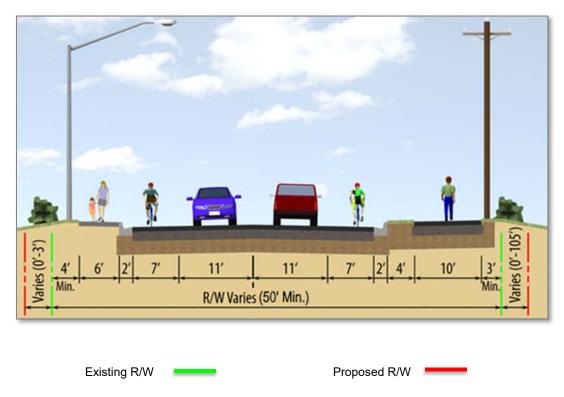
BUILD ALTERNATIVE 3 - ROADWAY TYPICAL SECTION
